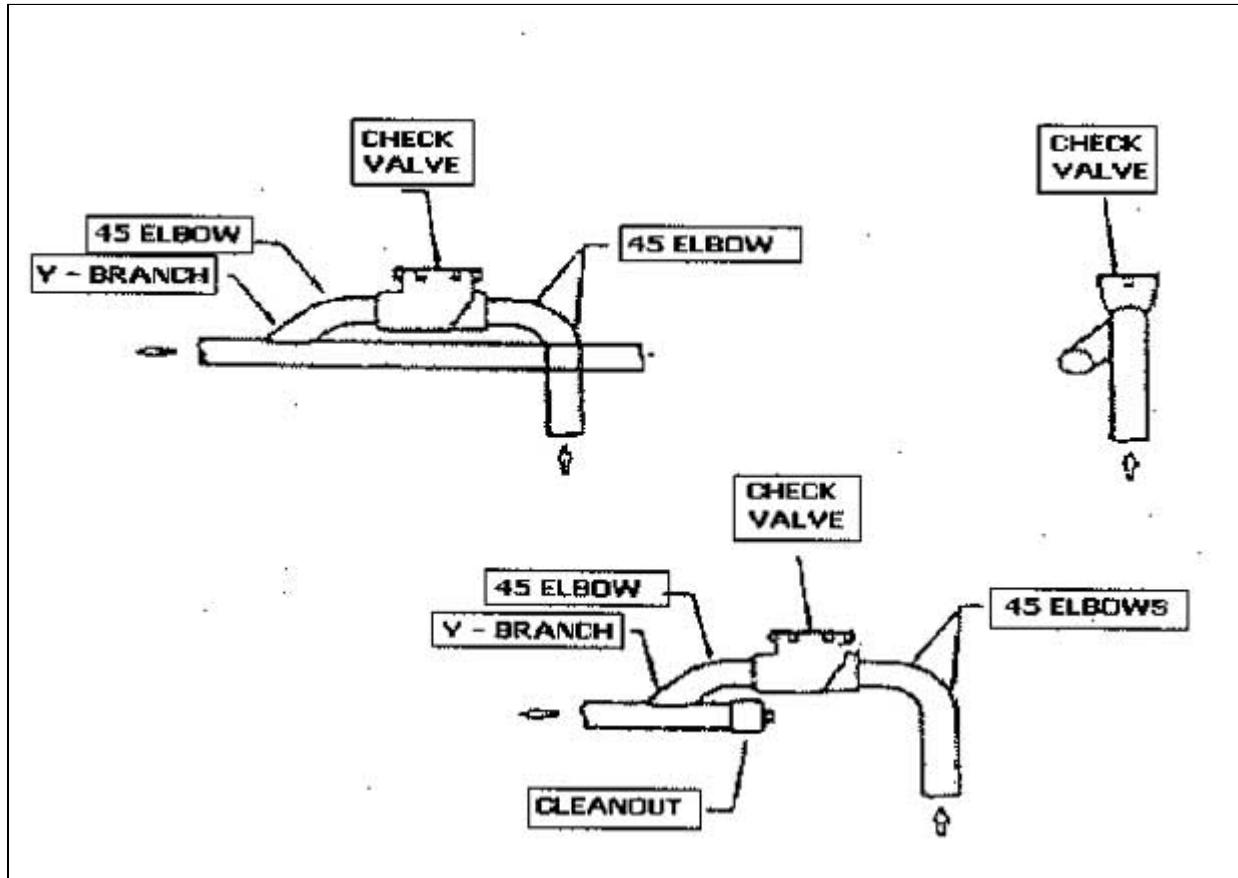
HORIZONTAL TO HORIZONTAL CONNECTIONFIGURE F-4 VERTICAL LIFT TO HORIZONTAL CONNECTIONFIGURE F-5 HORIZONTAL TO VERTICAL LIFT CONNECTION
